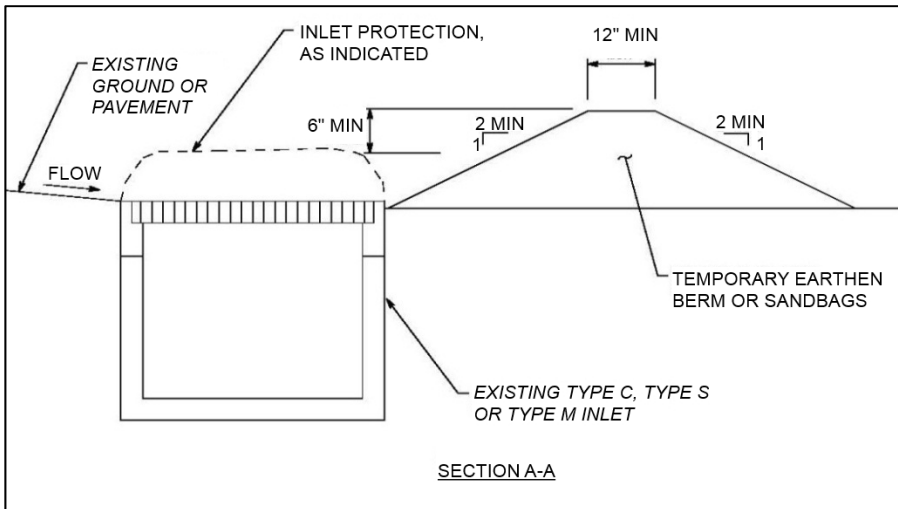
Storm Inlet Protection – Type C, Type S or Type M Inlet Protection Side View
